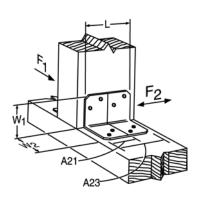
A21 AND A23 ANGLE INSTALLATION DETAIL
